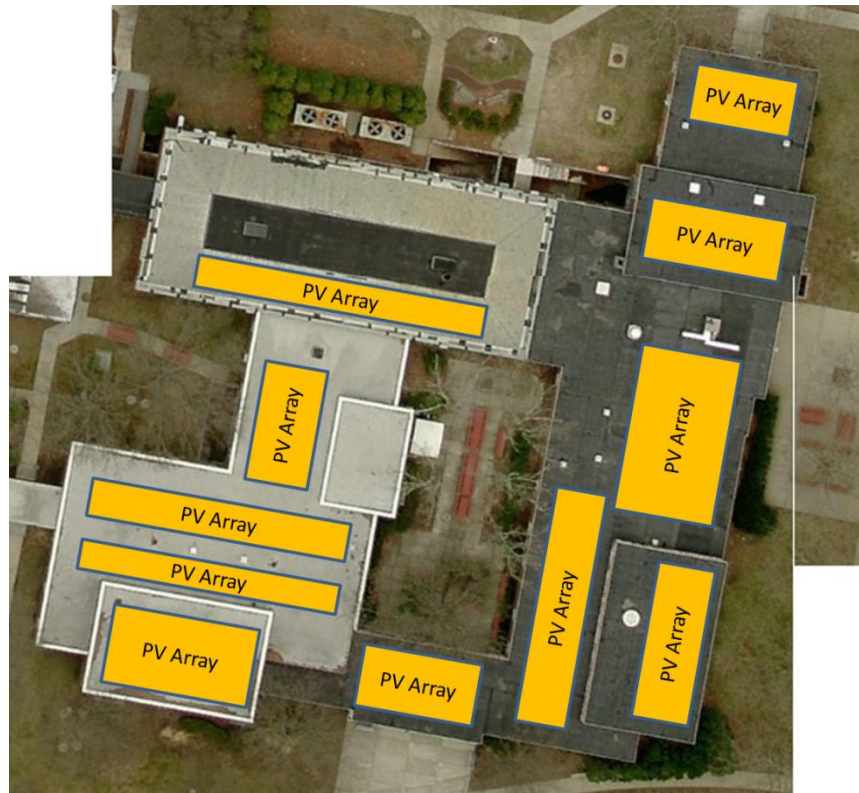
Roof of Labor Dept. Data Processing with possible PV arrangement.
